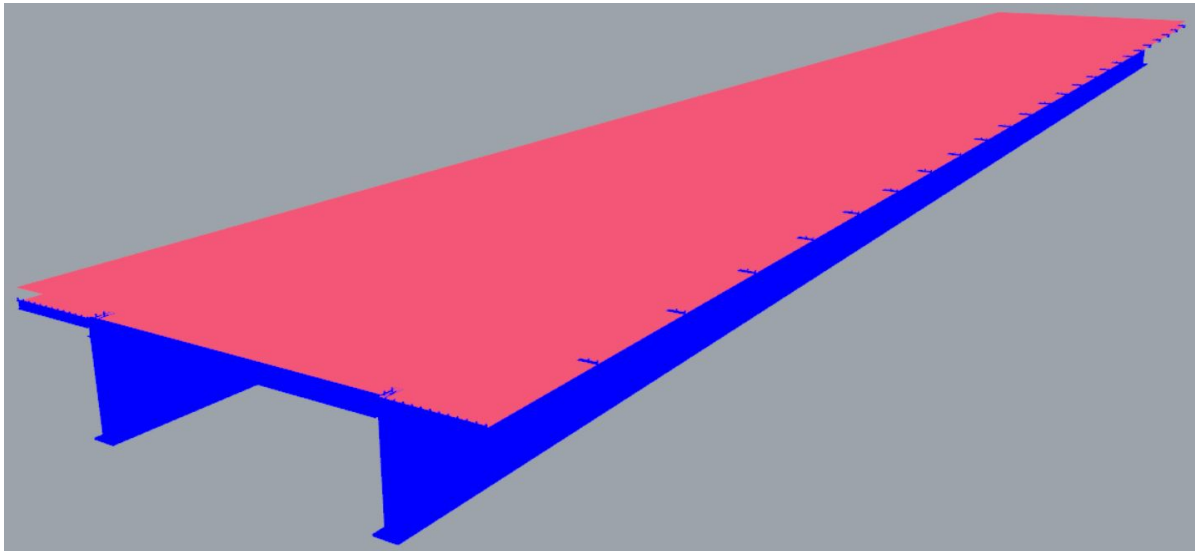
Double-girder bridge as modelled with Karamba in Grasshopper, in blue the girders, in red the concrete deck
